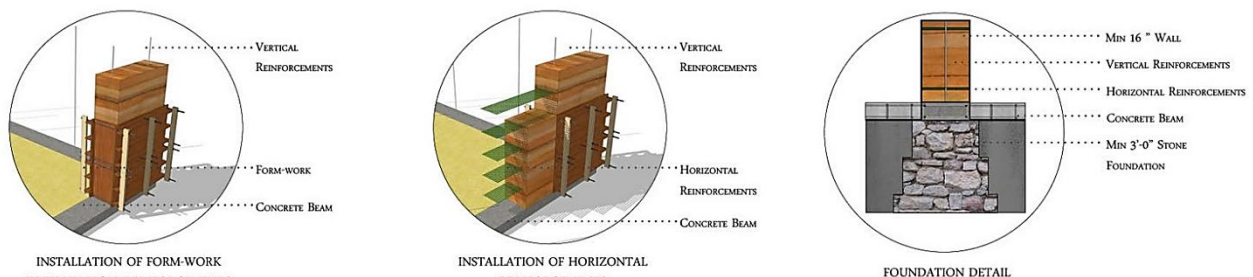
Installation details of the rammed earth construction (Source: Abari.earth)
